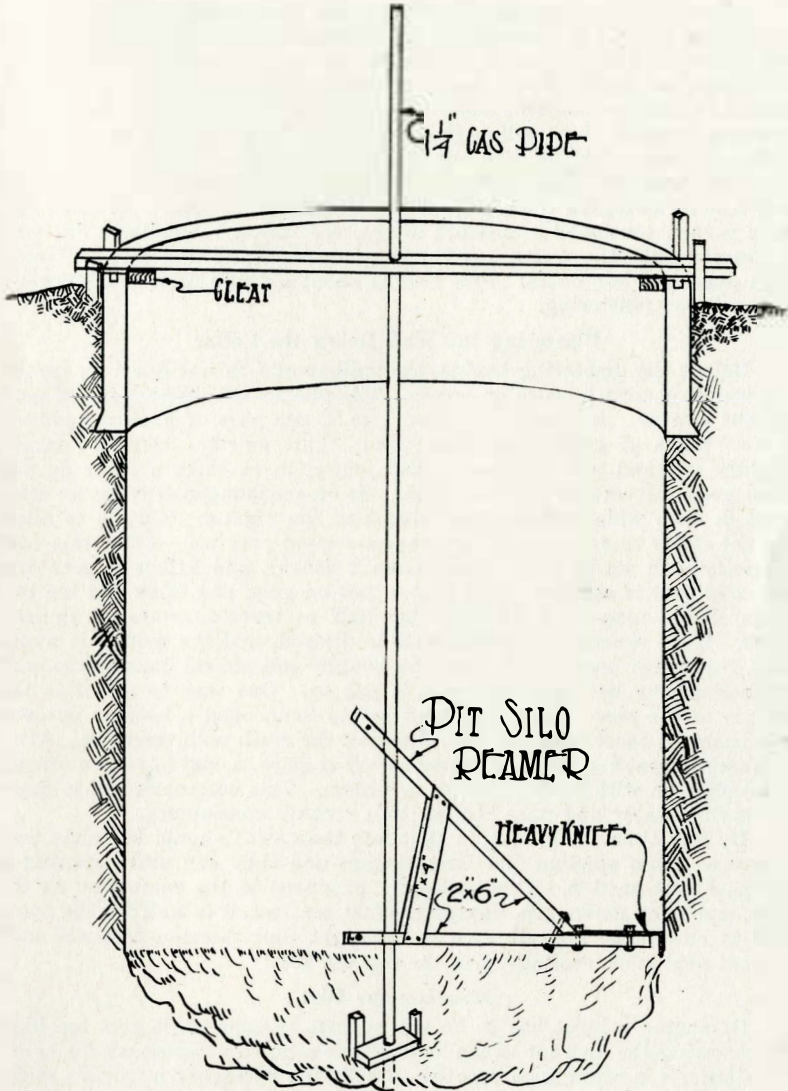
REAMER FOR SMOOTHING AND TRUEING THE WALLS
